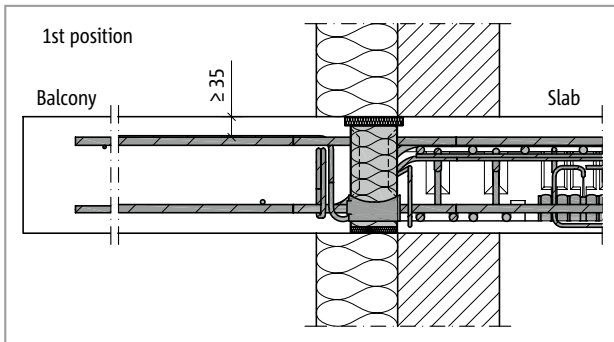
Schöck Isokorb® T type C: Section 1st position; connection with thermal insulation composite system (TICS)
